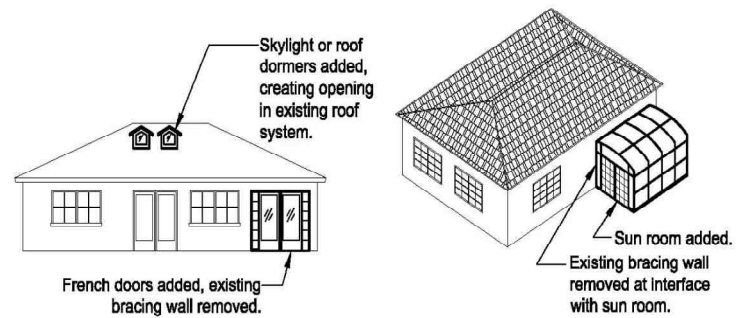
, Alterations to existing house: bracing wall and roof modifications (left) and modification for the addition of sun room (right).
